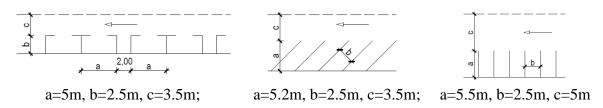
Dimensions of the parking spaces according to the type (Source: BME, Department of Industrial and Agricultural Building Design, 2013)
